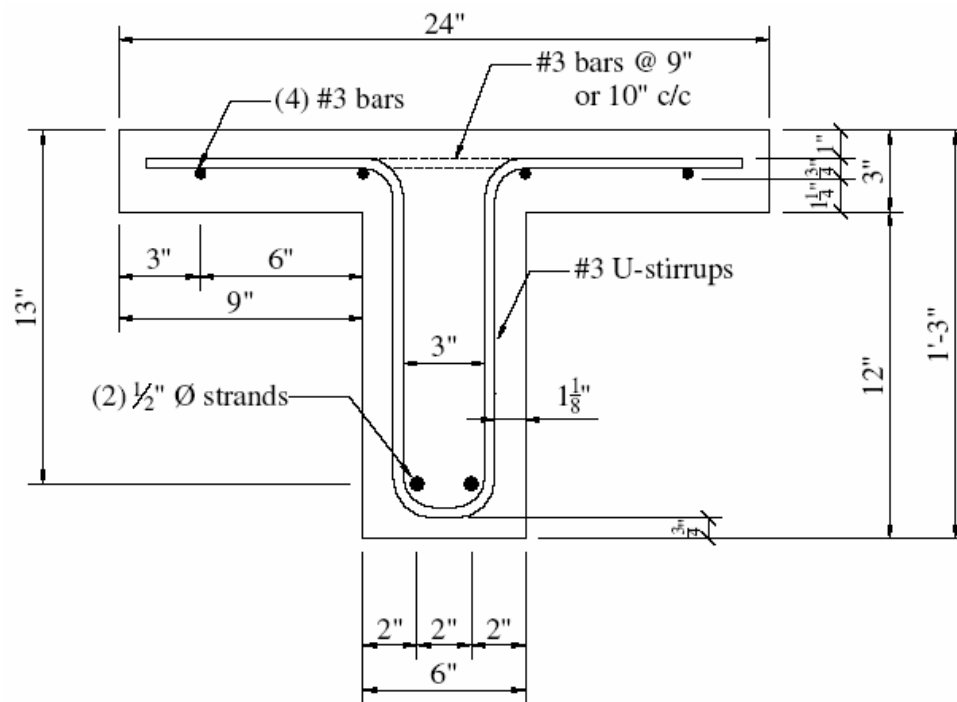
T-Beam Cross Section Detail (Levy 2007)
